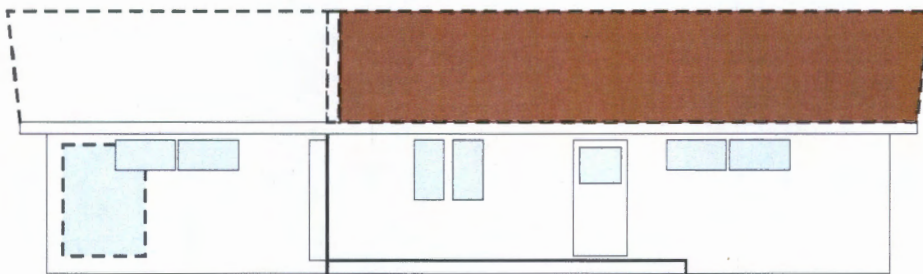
Elevation view existing of the house with addition, viewed from the south. New roof is outlined with dotted lines surrounding white space. Three new addition windows are shown. The existing double door that will open into the addition is shown with dotted outline, showing only the part not directly in back of the new windows. Locations of windows on the addition may change based on information obtained in the building permit application process.
